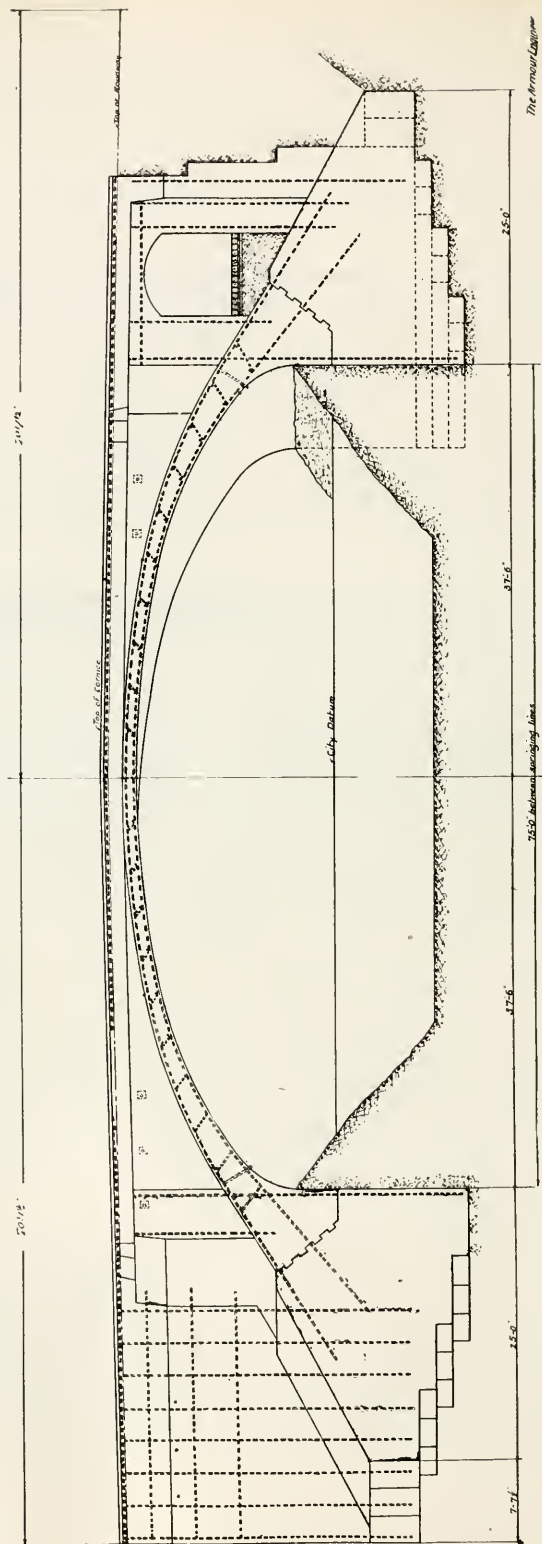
LONGITUDINAL SECTION AT CENTER LINE OF BRIDGE.
